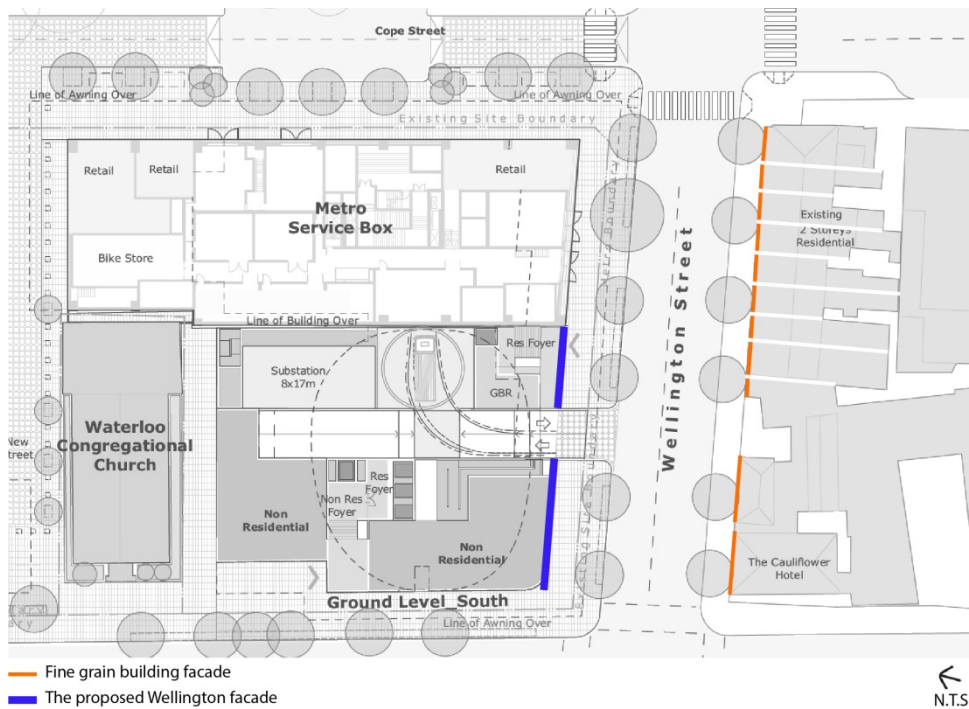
Wellington Street street pattern (Adapted from Turner and Turf)
